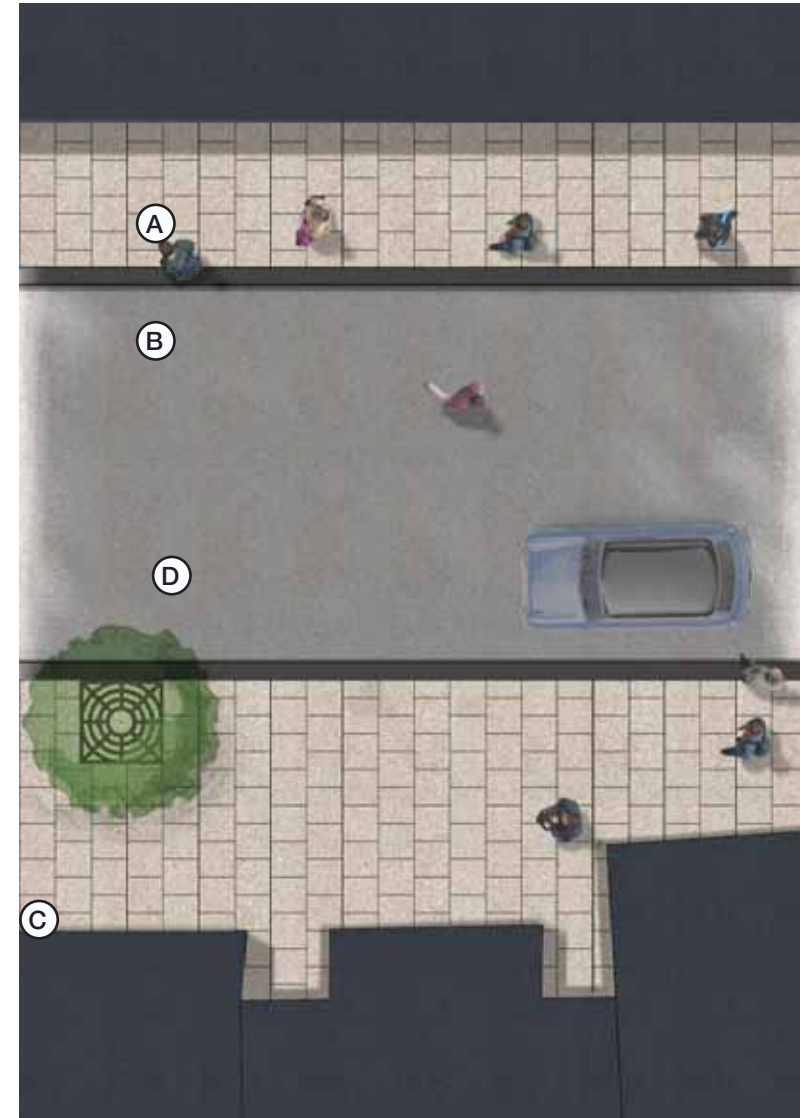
Concept sketch plan illustrating typical layout and materials of the street (Example Railway Street between South Street and Bircherley Green)
